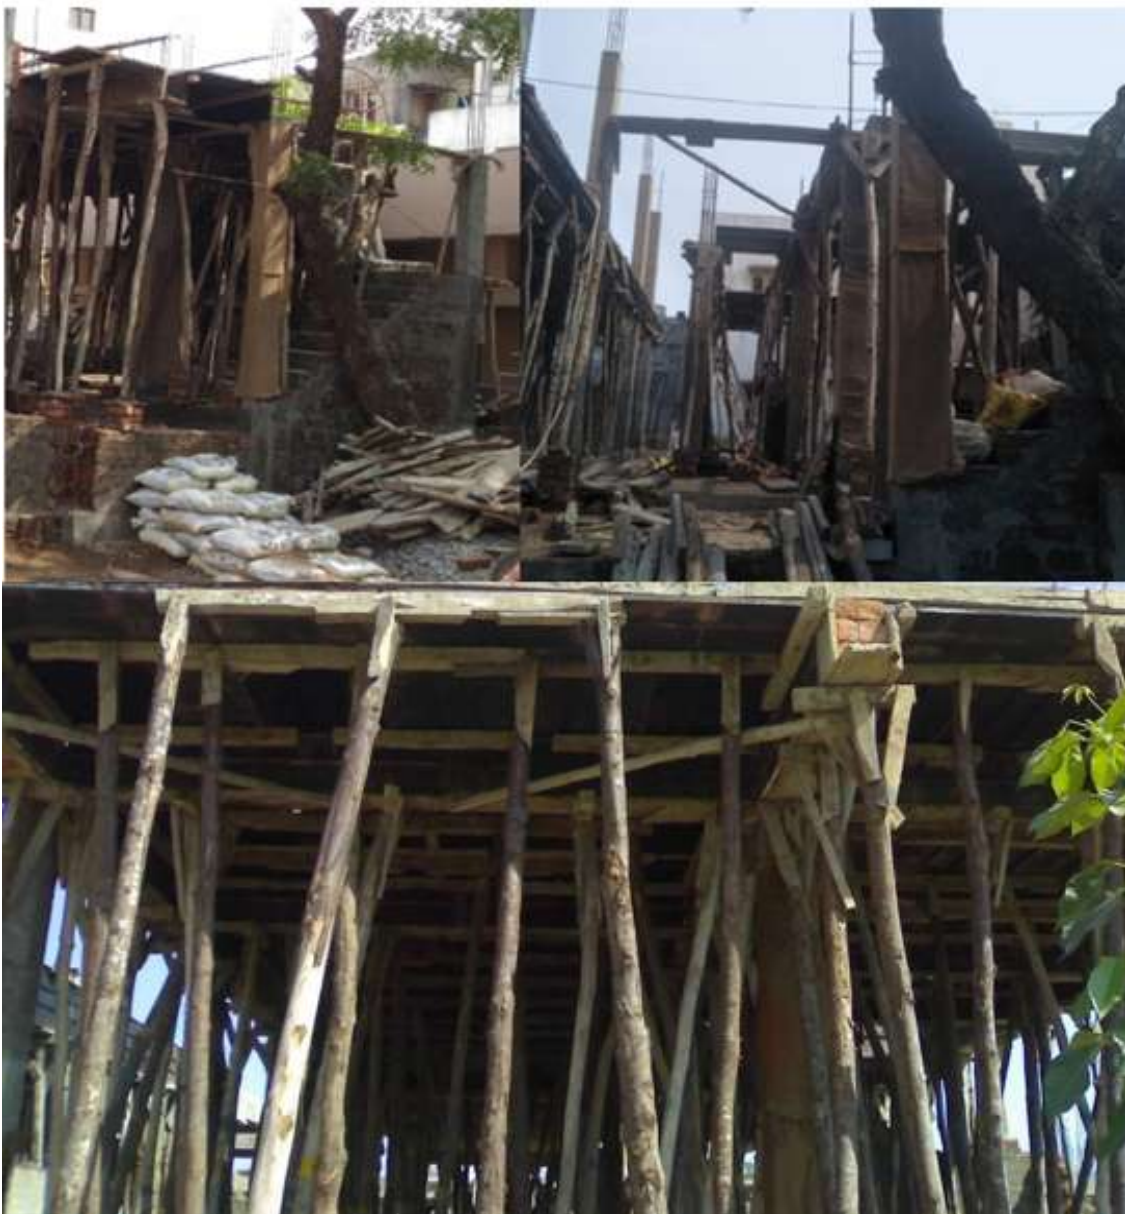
Formwork for slab construction built out of bamboo posts, decks and wooden panels
